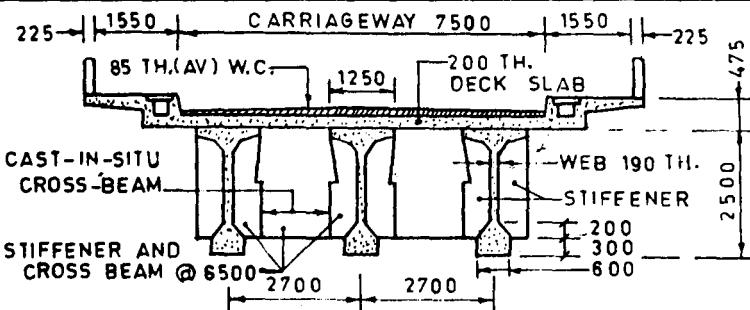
·13 DETAILS OF BRIDGE DECK ( Example 16·1 )
